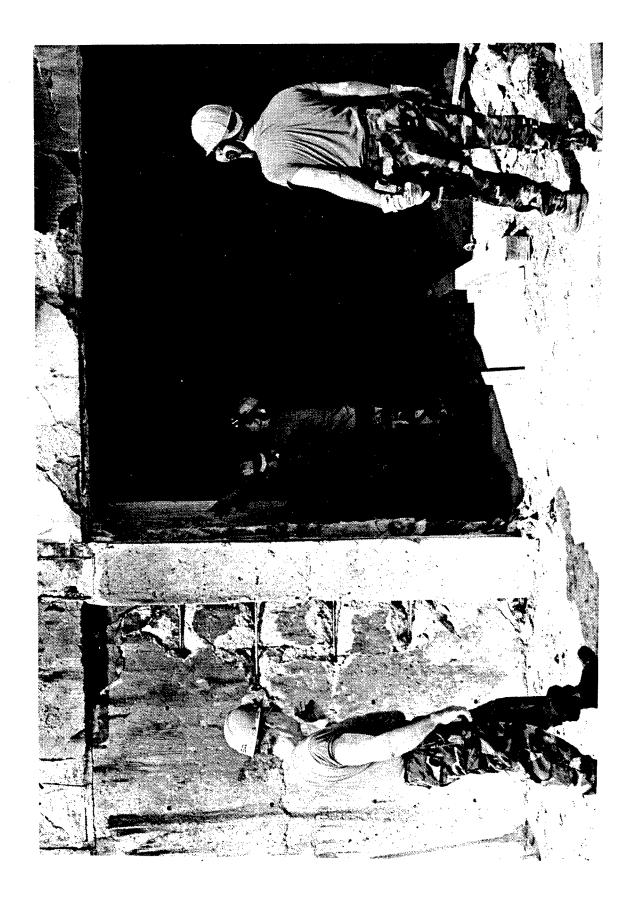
Inserting Wooden Wedges Between Replacement Column and Roof Beam.
